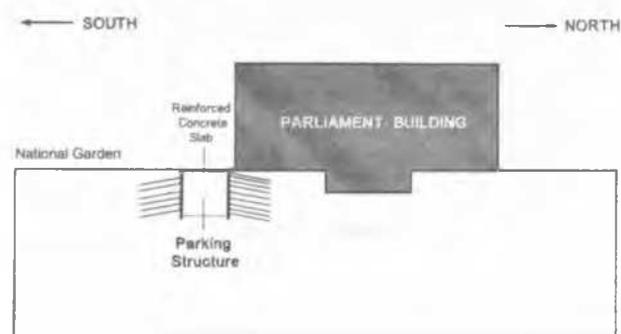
Typical cross section of supported excavation (south side of Parliament building)
